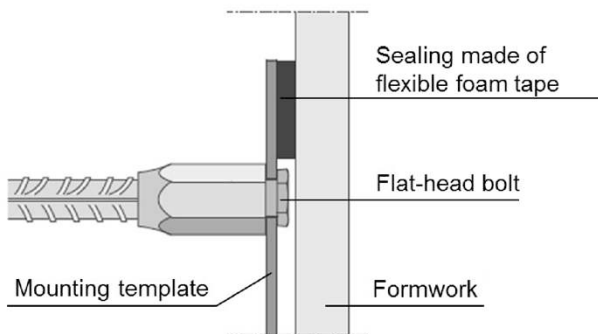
Installation principle for recessed connection level: mounting template inset from face of concrete, cavity to the formwork
